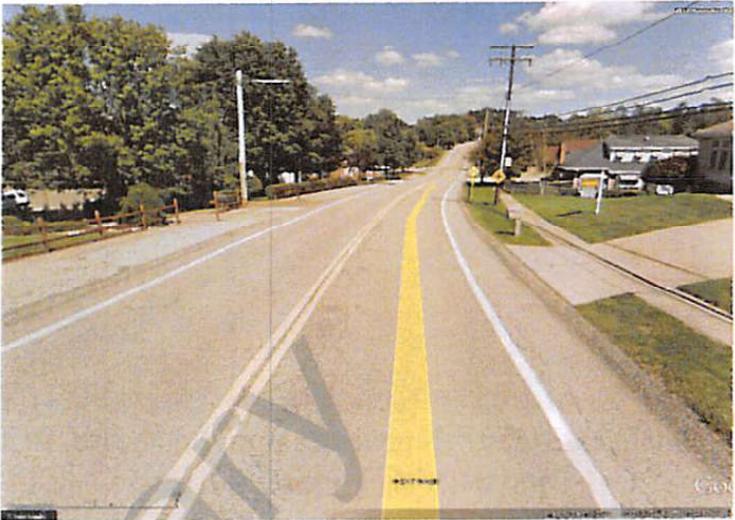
B-2 (north); Residential Condition with existing sidewalk Cross Section View
